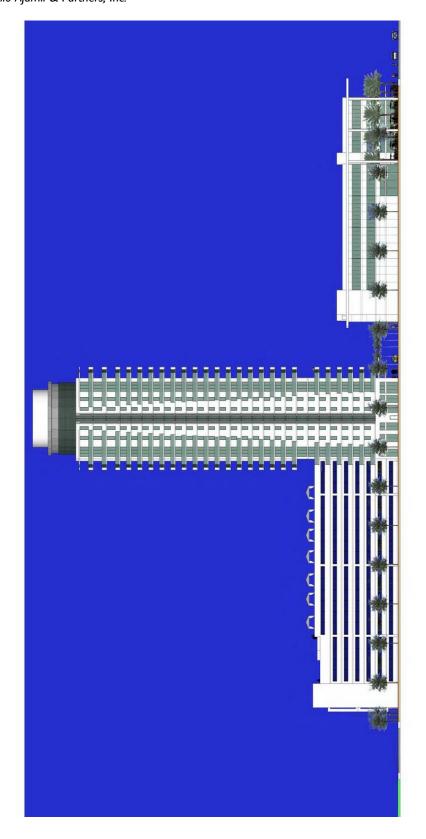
Oasis West Elevation Source: Bermello Ajamil & Partners, Inc
